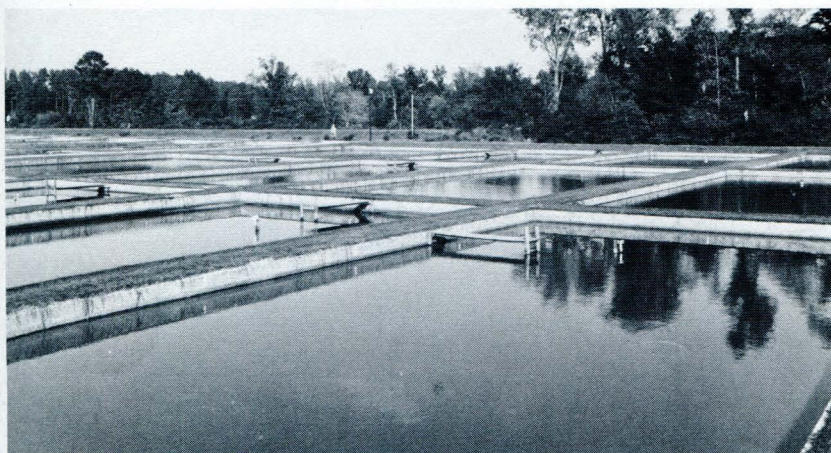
Pond constructed with concrete retaining walls to prevent erosion and to maintain exact area.
